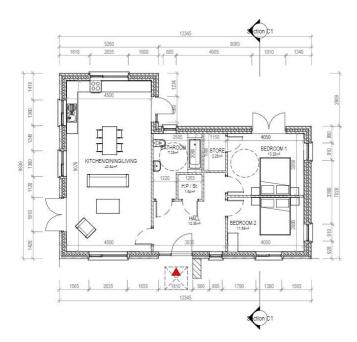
Floor plan of house type D2 showing wheelchair turning circles and wide circulation areas
